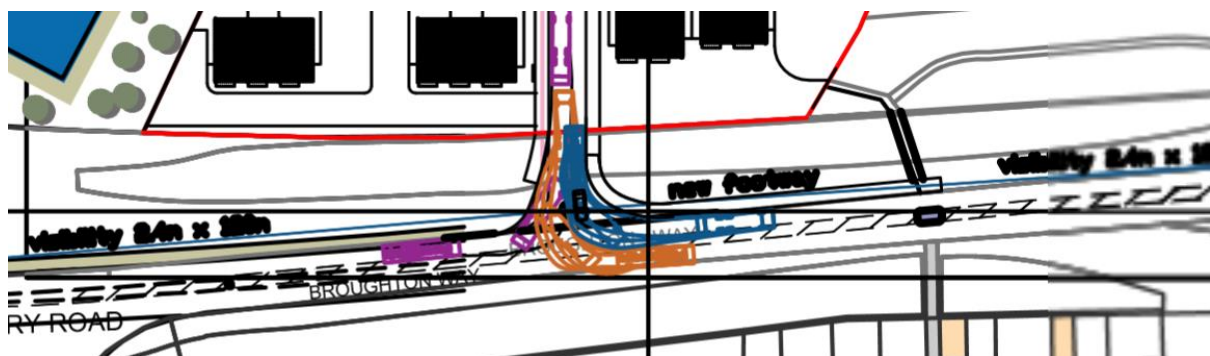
extract from the amended site layout drawing (drawing 21112-002, Thorne Architecture – site layout itself is superseded)
